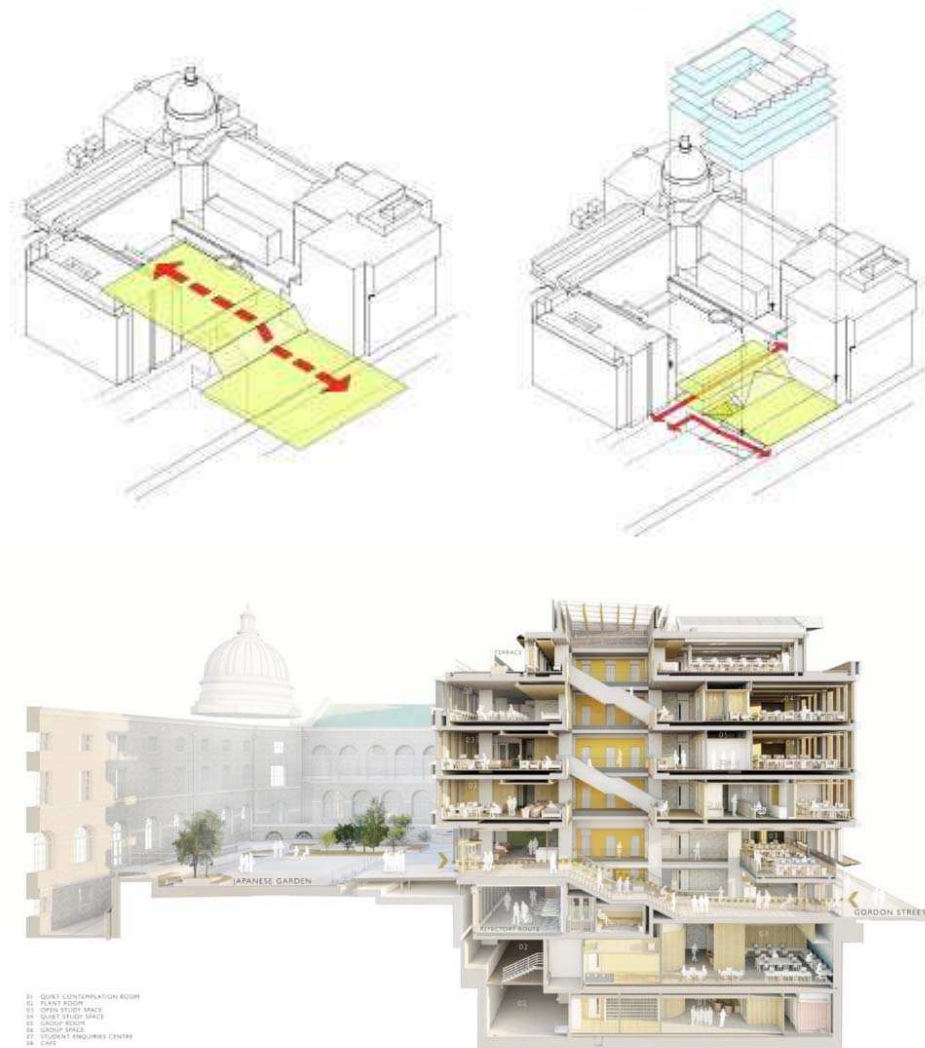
UCL the new Student Center concept and section drawings . (@ Nicholas Hare Architects)
